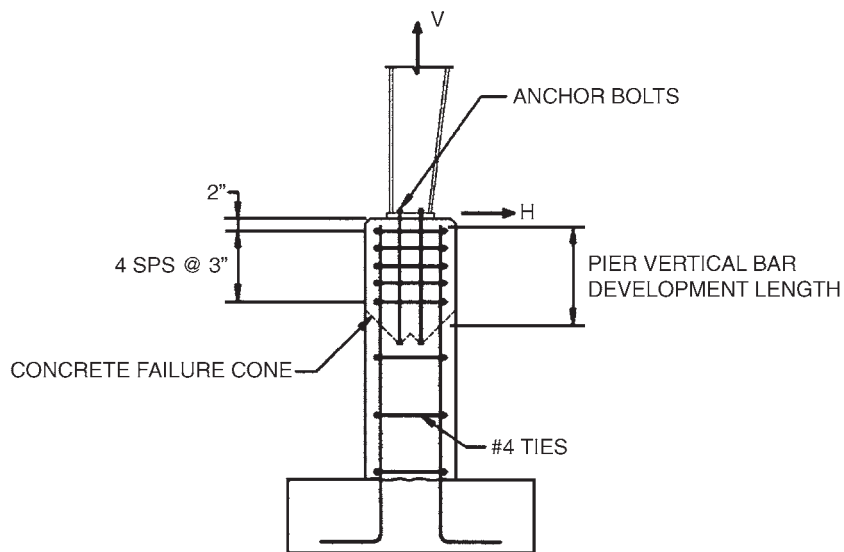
Transfer of tension and lateral loads into column pier by engaging vertical rebars.
